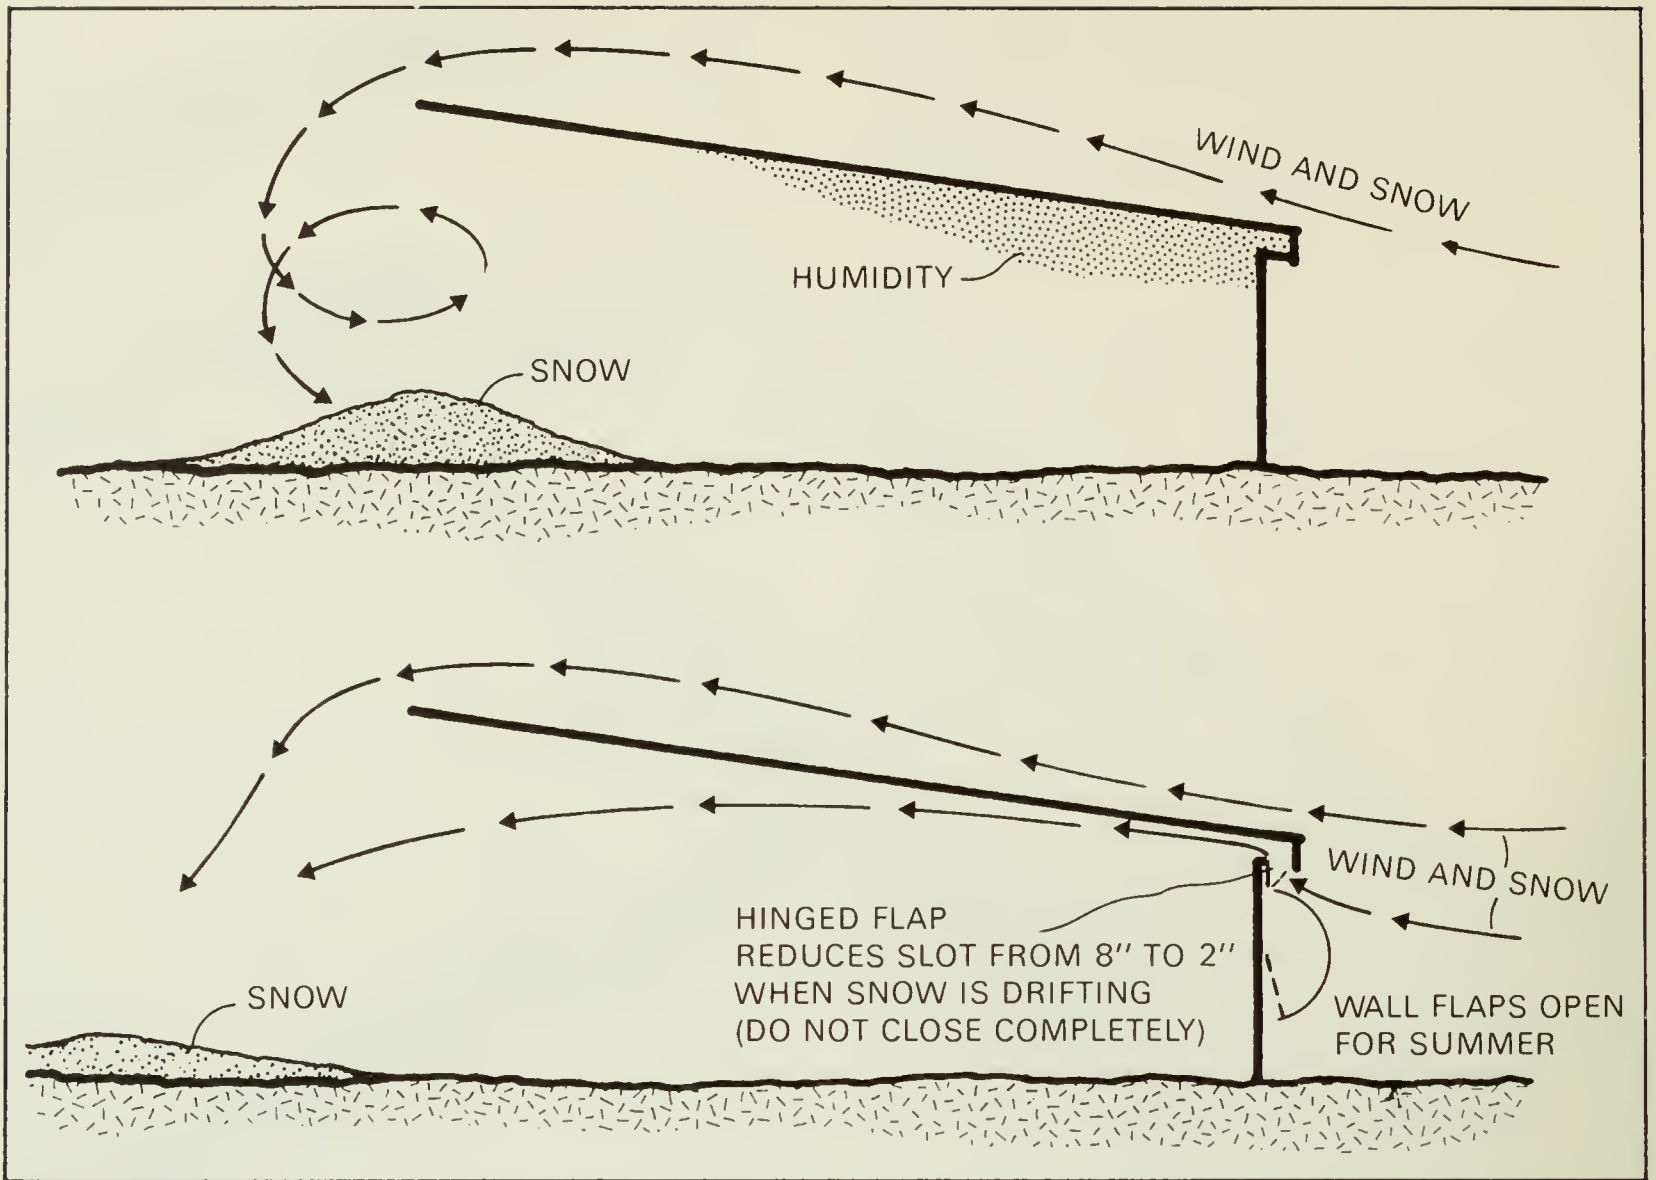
Open-front shed with tight back wall (top) can have snow and humidity problems. Adjustable eave and wall openings (bottom) improve ventilation and help to control snow drifting.
